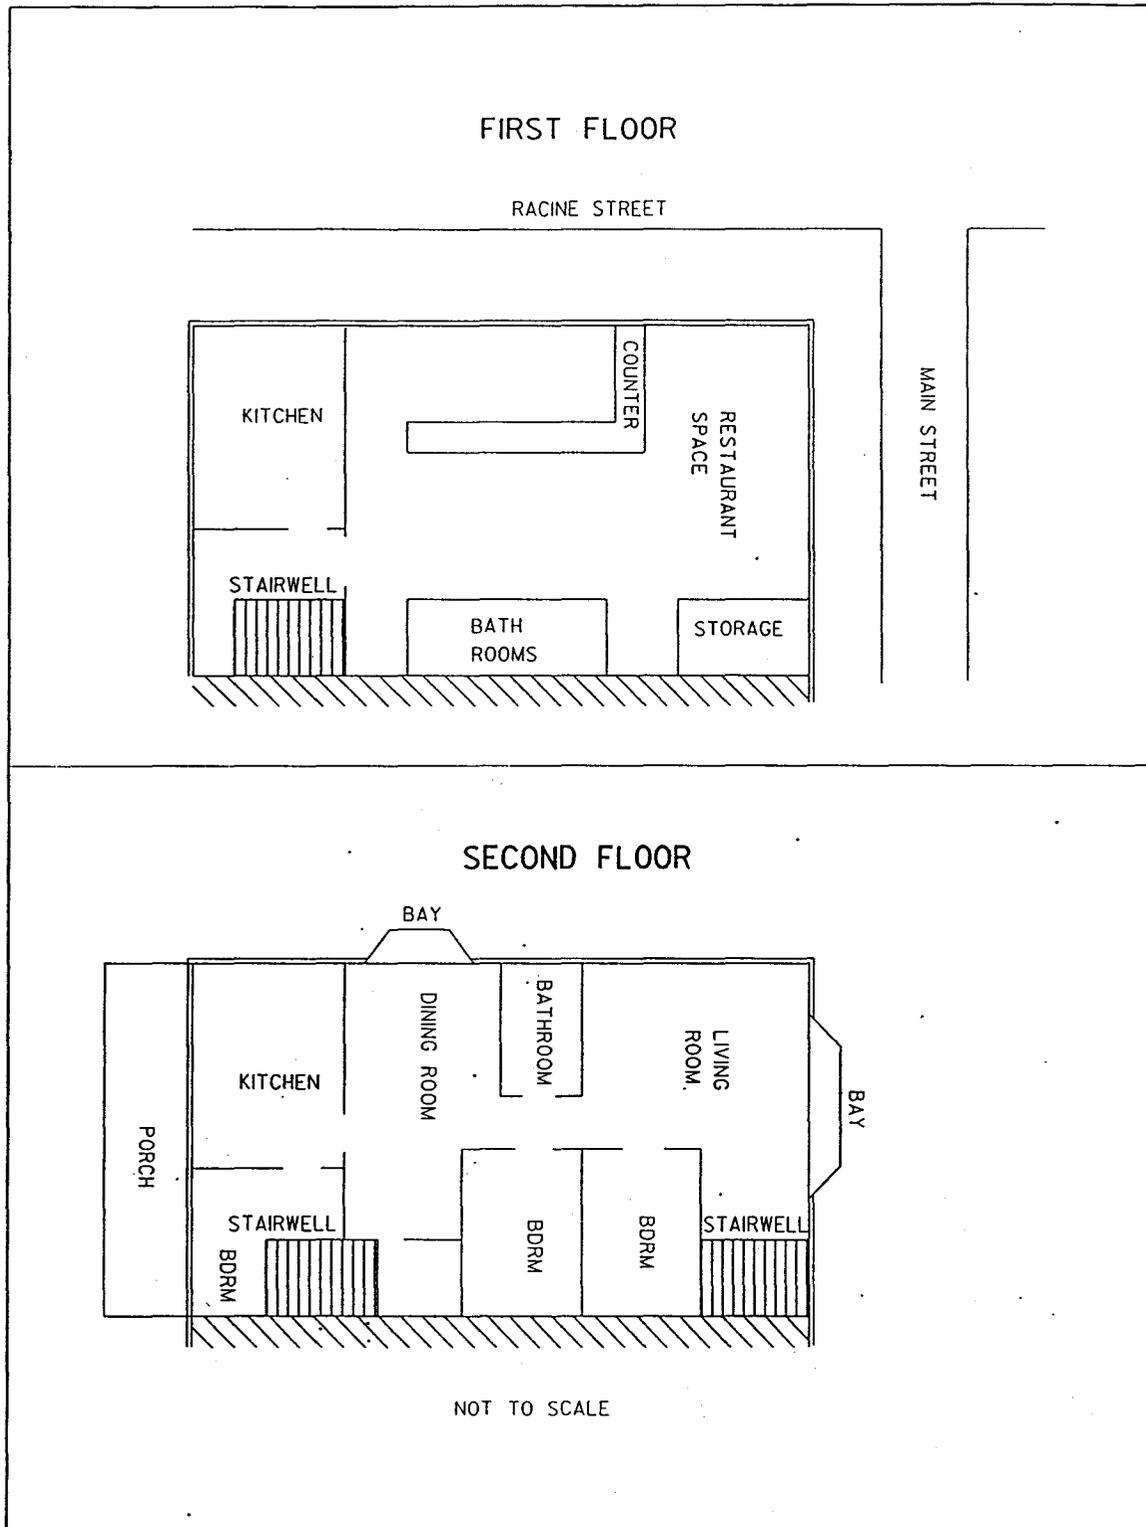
Floor Plan for the Bruno P. Beck Building (Redding's Restaurant), 101-103 South Main Street, Jefferson, Wisconsin.
